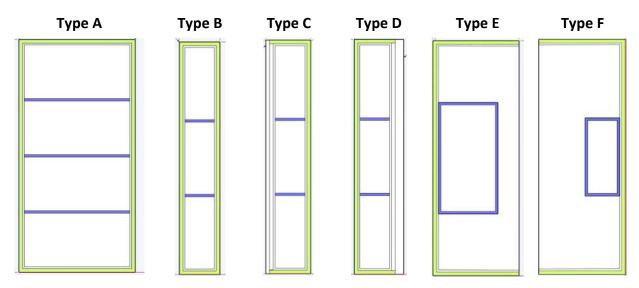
Six Basic V-RIP Panels - Types (A, B, C, D, E, & F) for Wall Layout
